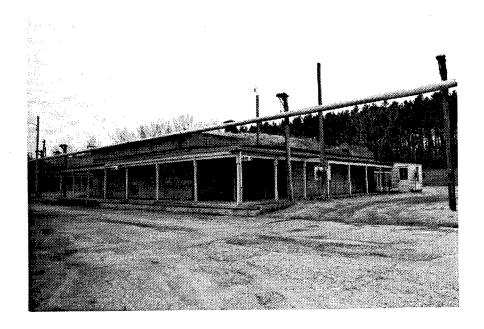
Building 6810-09: Press House that has a reinforced concrete arch 36 feet long with an interior radius of 10 feet, and a minimum of 5 feet of earth covering the structure.
